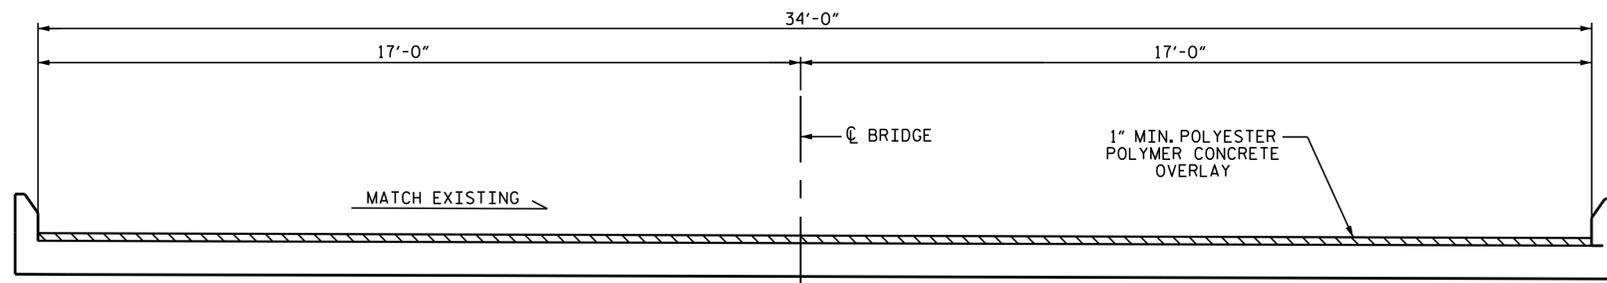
DETAIL FOR POLYESTER POLYMER CONCRETE OVERLAY
